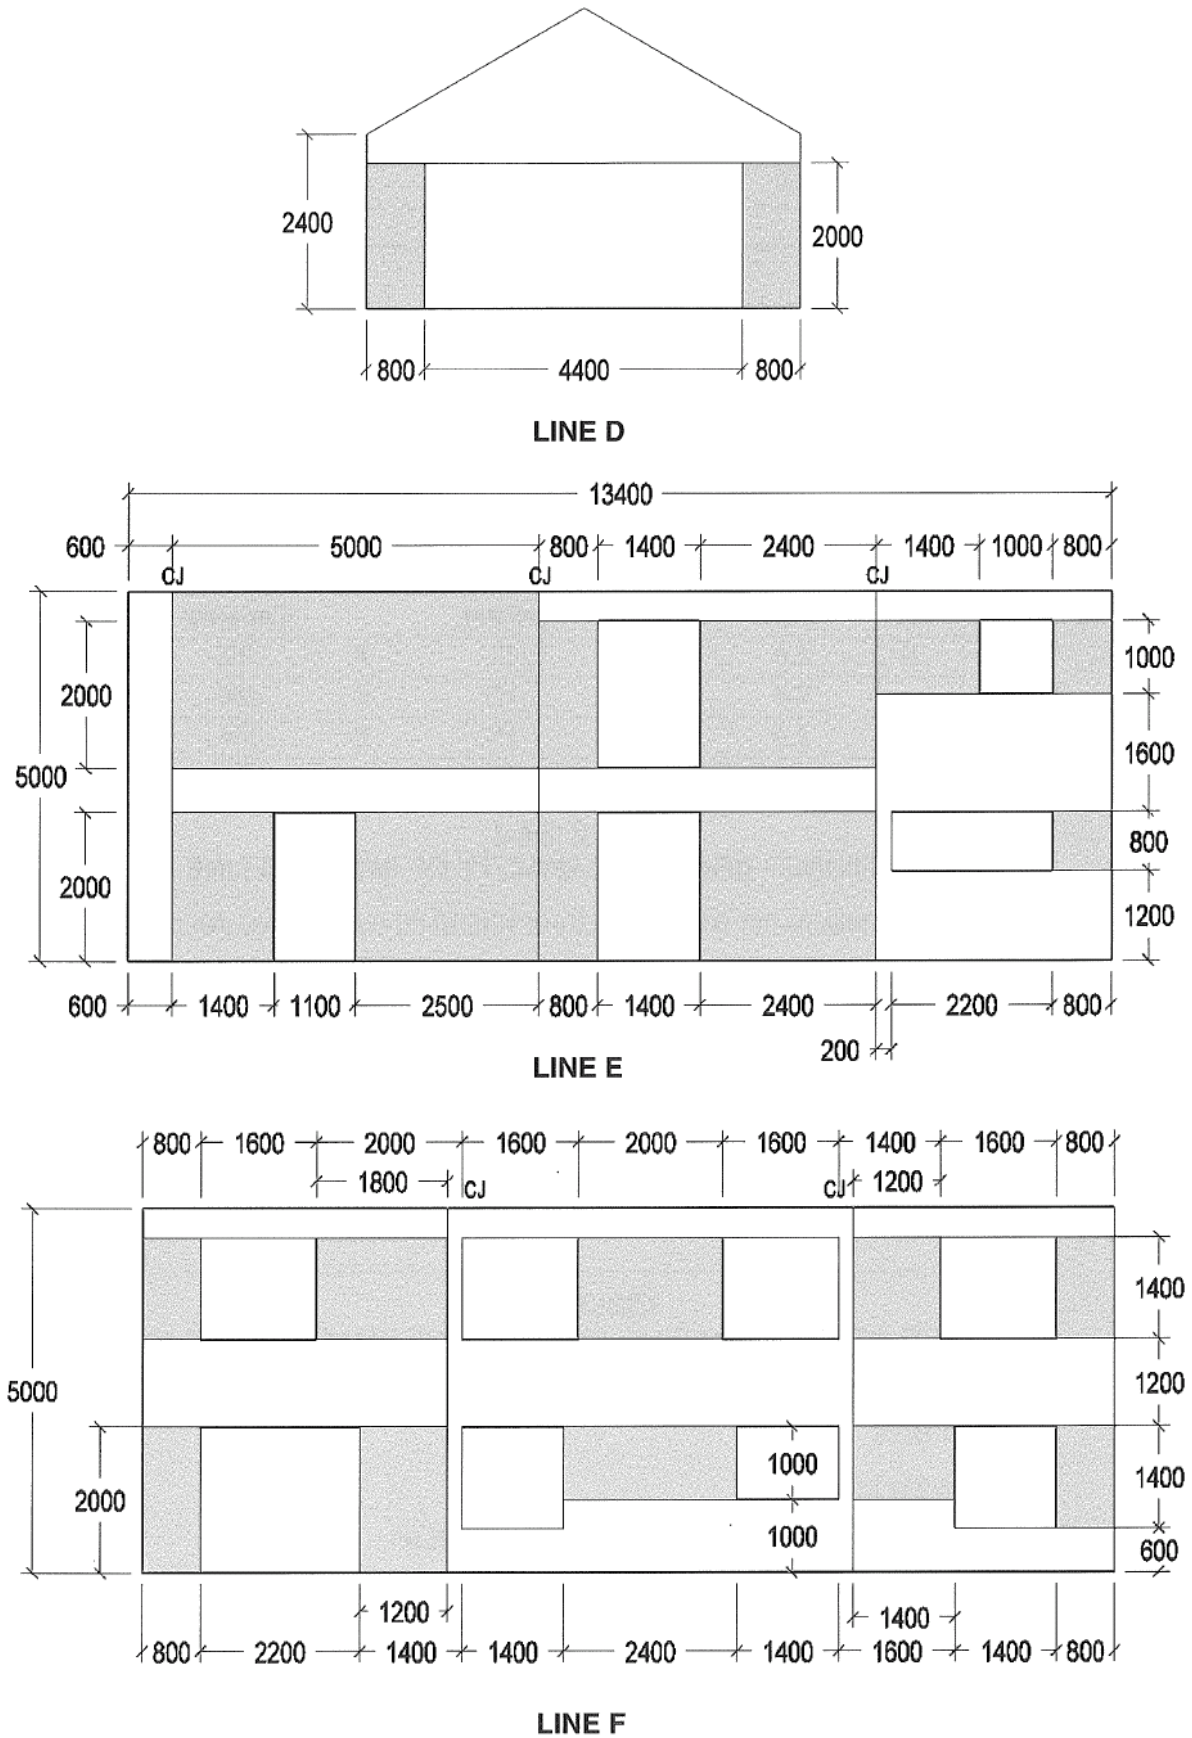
(Continued) Bracing Panels for Design Example 4
